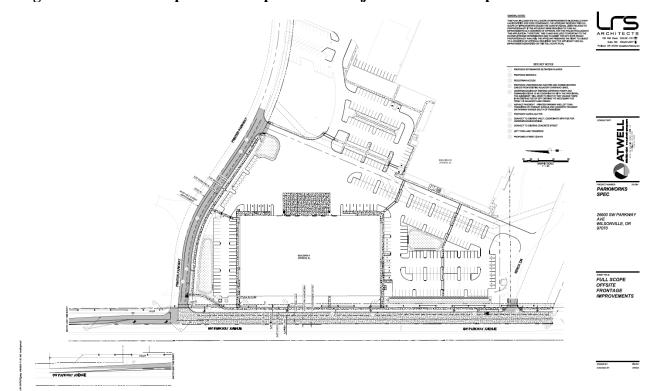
Aerial of Proposed Development and Adjacent Off-Site Improvements
